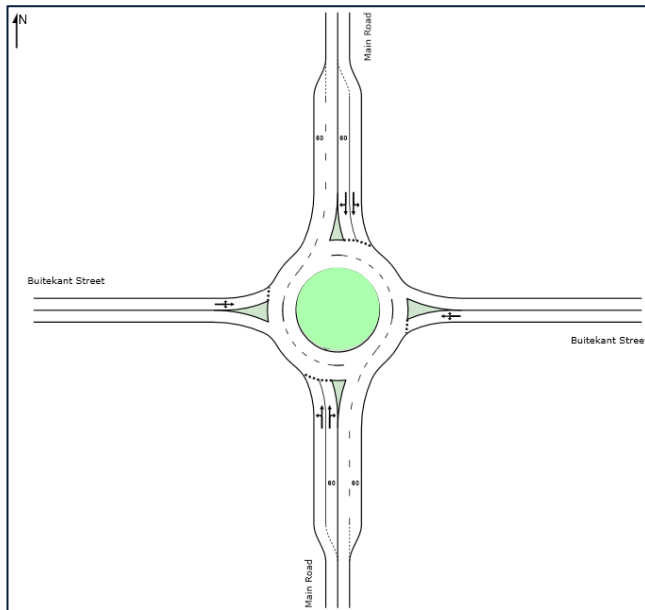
Main Road and Buitekant Street: Proposed Layout
